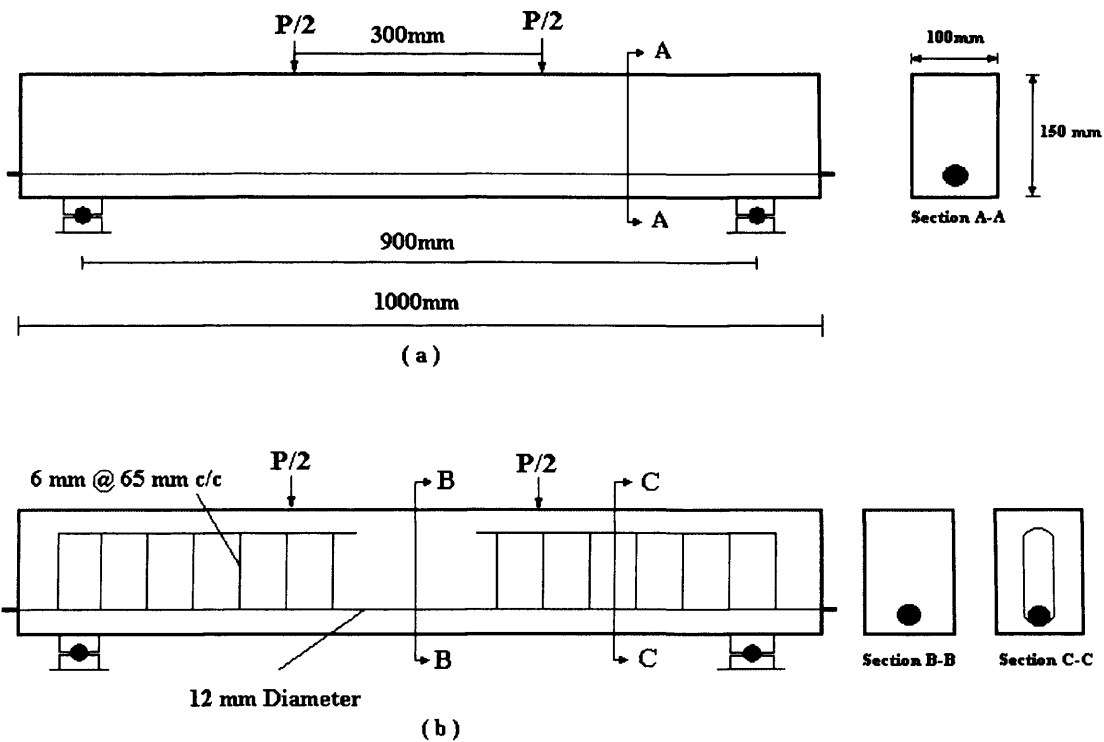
Beam details (a) Explanation of beam dimensions and internal steel reinforcement, (b) Beam with sufficient shear reinforcement
